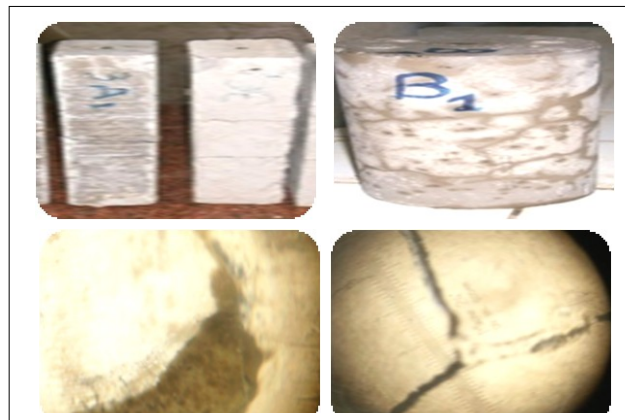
Cracks, checking cracks, gel exudation and discoloration faces in the cylinder and prismatic samples with (B) concrete during 6 storage months (M24X).
